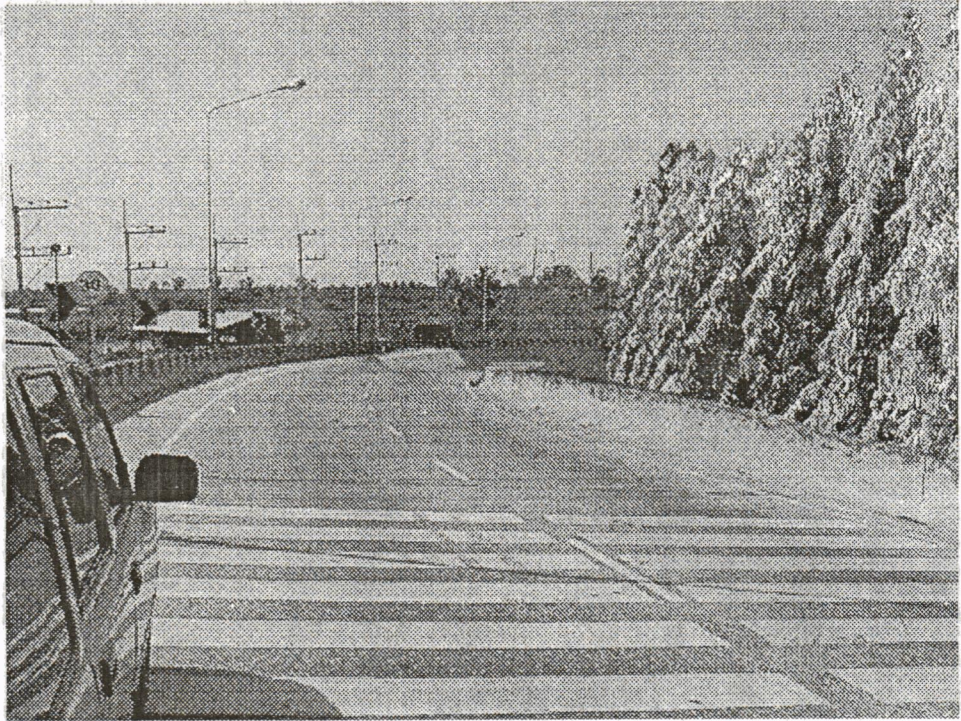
Show Improvement to the Concrete Noise Barrier by Reducing the Height to 0.80 m.
